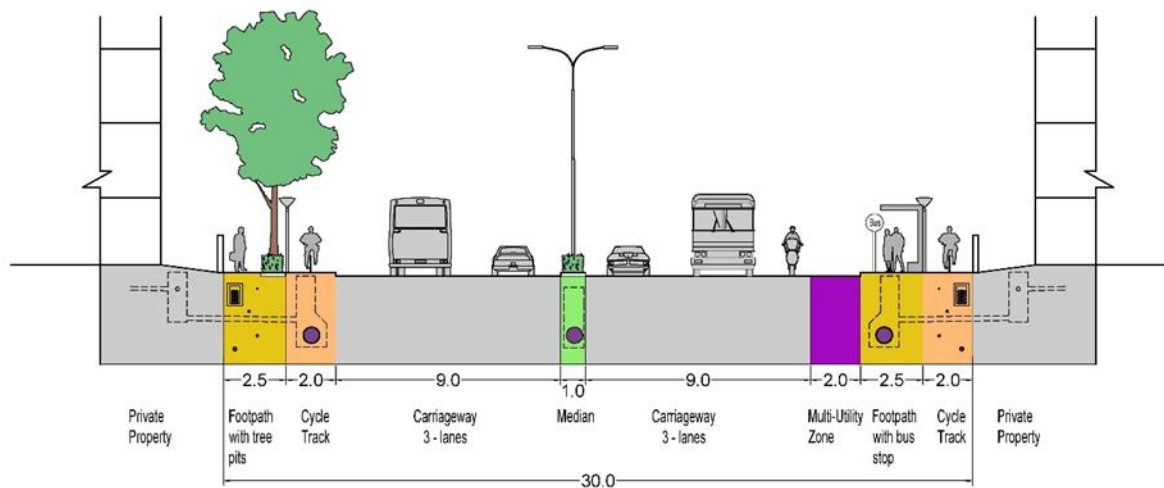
TYPICAL SECTION OF 30M WIDE ROAD
